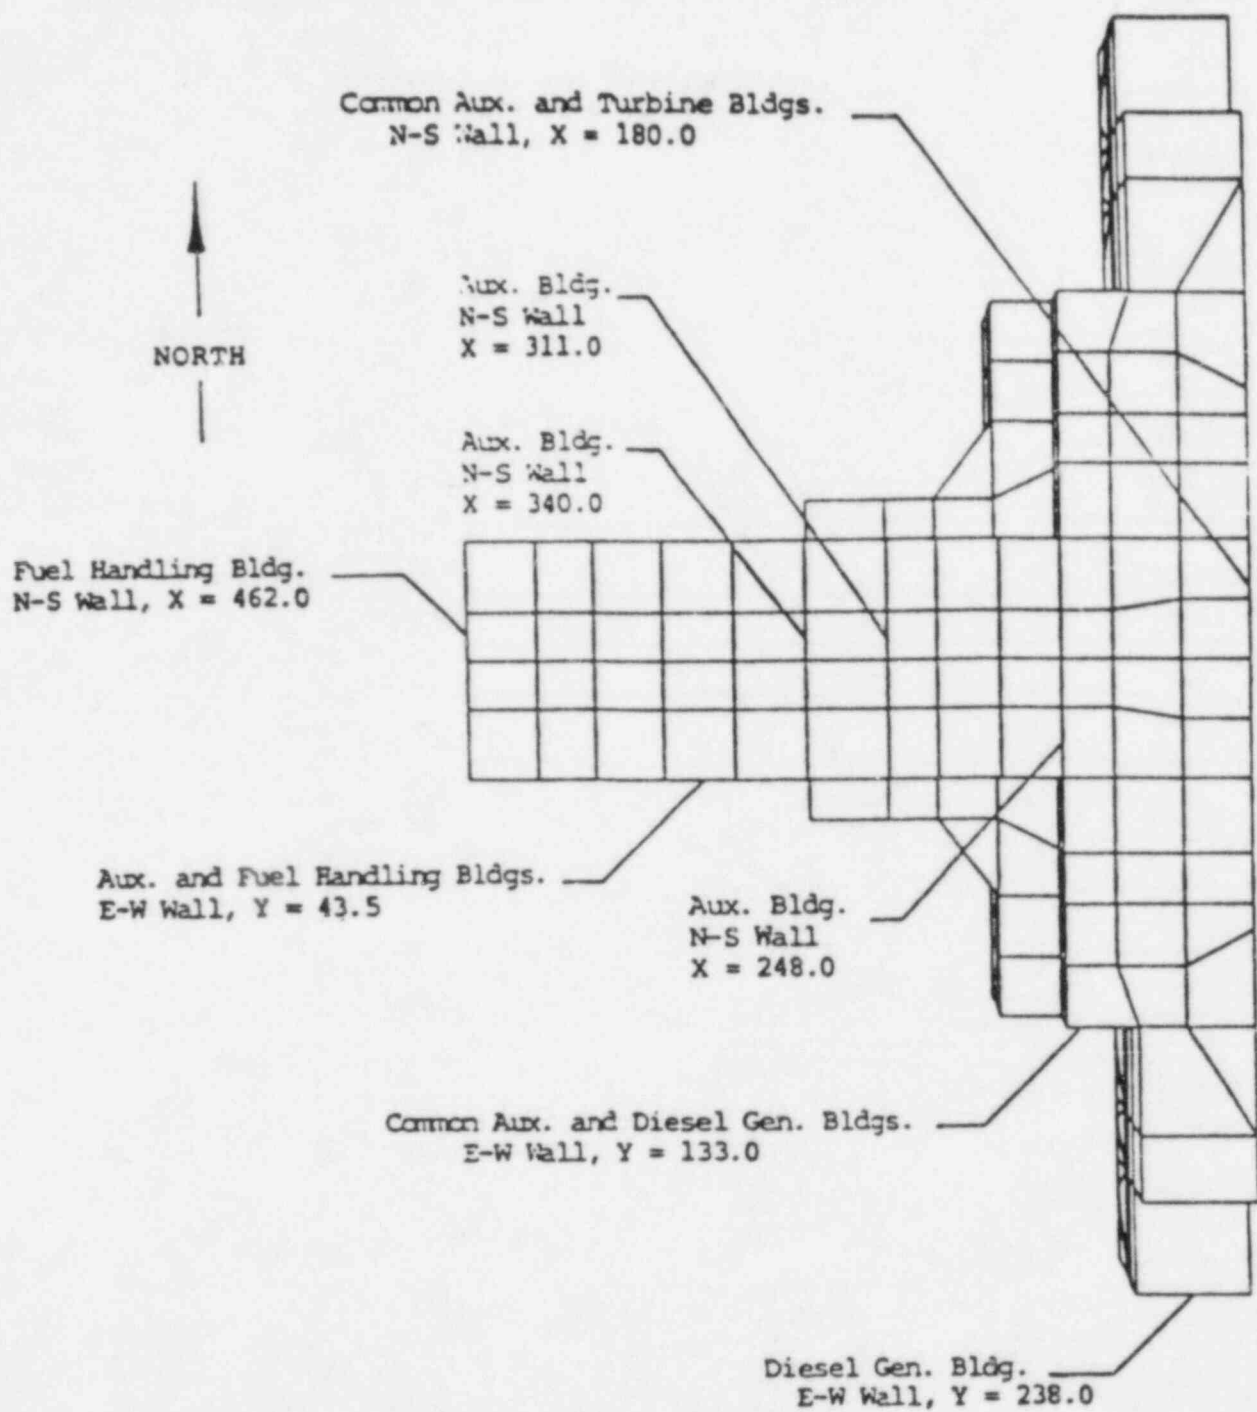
Plan view of shear wall structure model showing walls for which forces and moments were generated.
